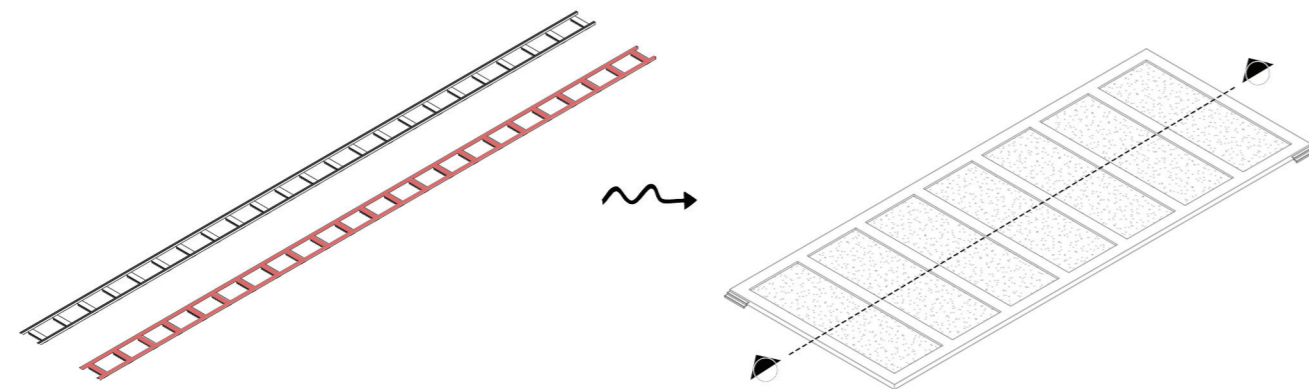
The design development of the Raised Bed. Inspired by the shape of the railroad existing in the ground floor of the building.
